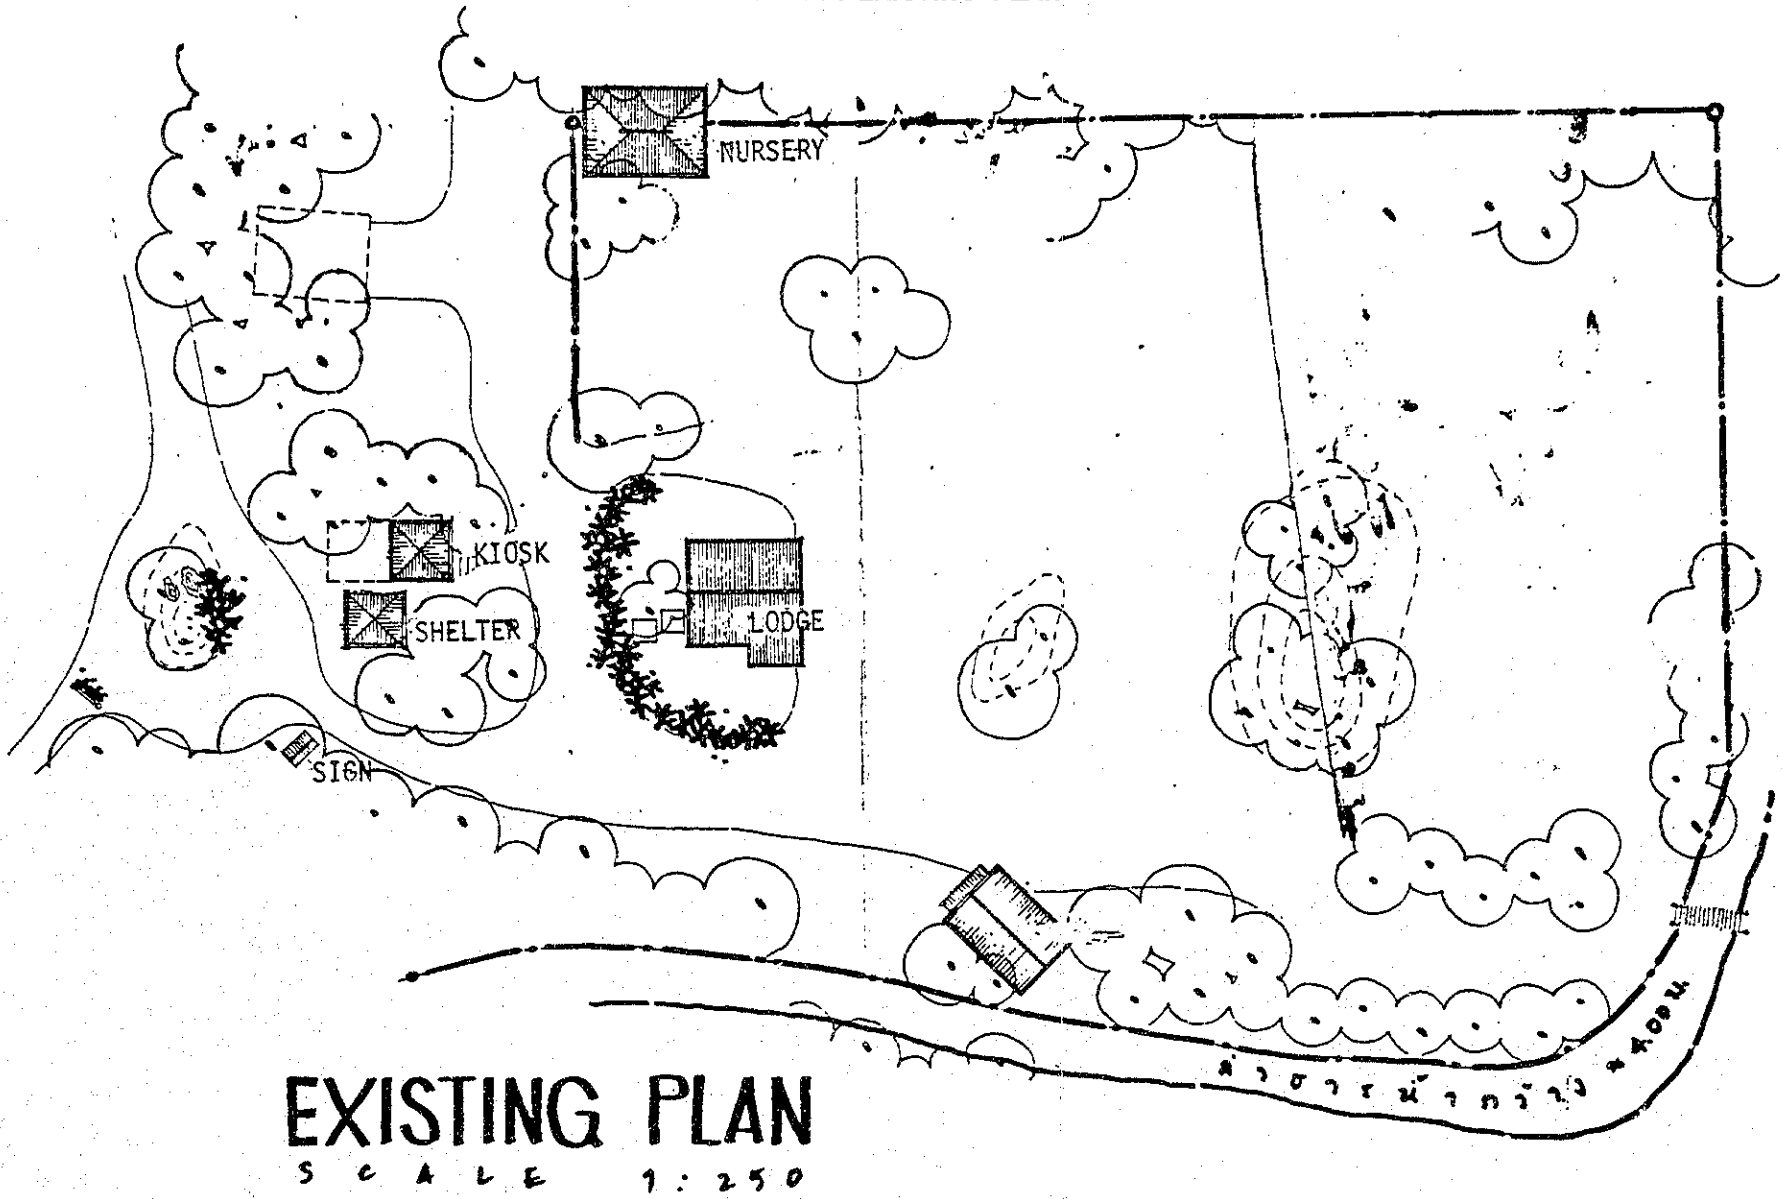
KHAO LAMPI-HAT THAI MUANG NATIONAL PARK SITE PLAN
